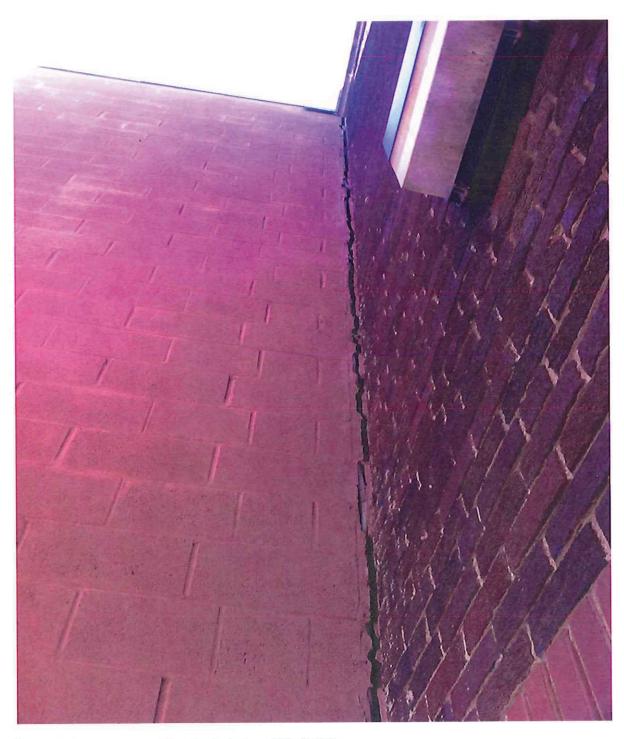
Settlement at Base of Stairs to Shop Classroom
